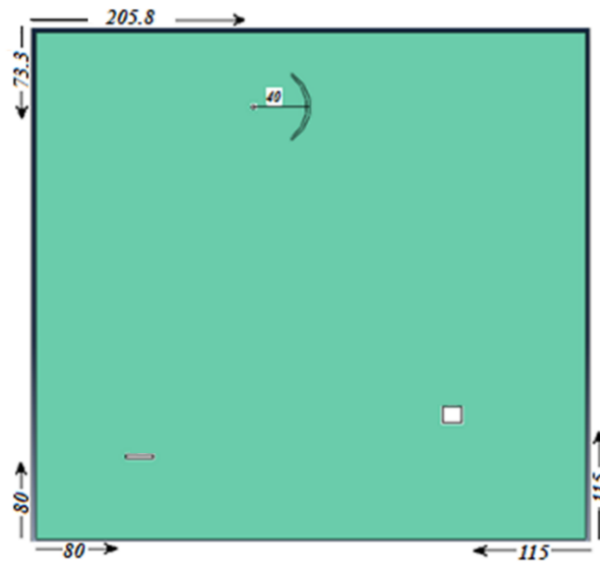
Geometry of the plate structure with the three damage (unit: cm)
